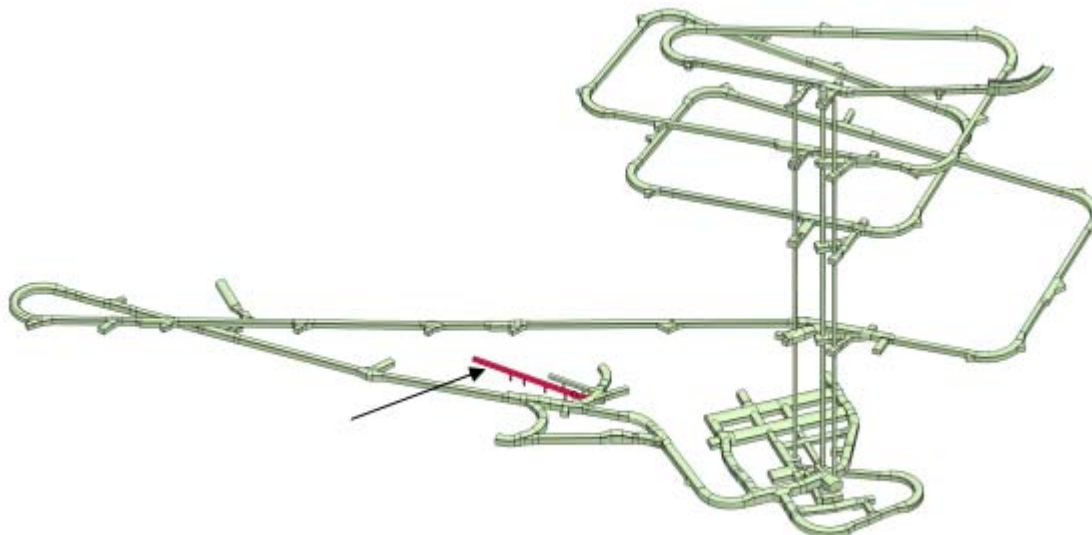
ONKALO and the demonstration tunnel 2 (red), where colloidal silica -grouting were carried out.
